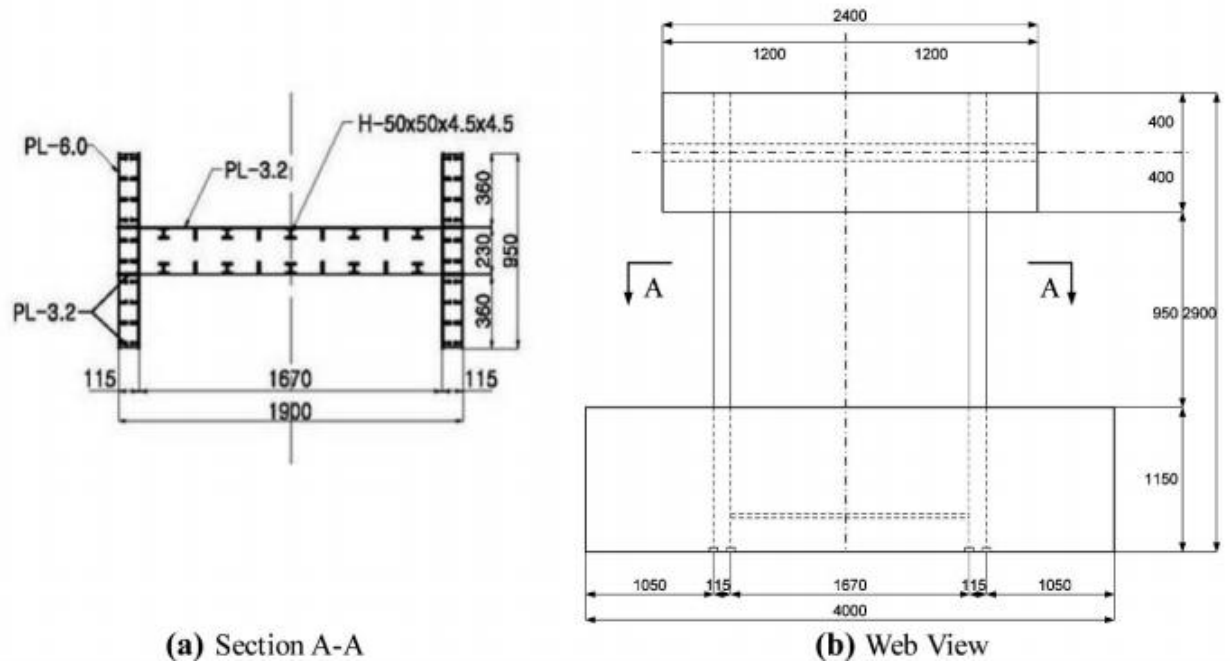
Geometric and Components detail of test specimen composite steel concrete shear wall (CSCSW-1), (AHMER, DOOKIE, & CHO., 2013)
